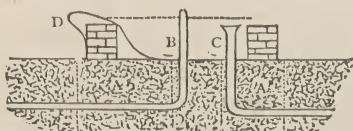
CONSTRUCTION OF GARDEN FOUNTAIN.
